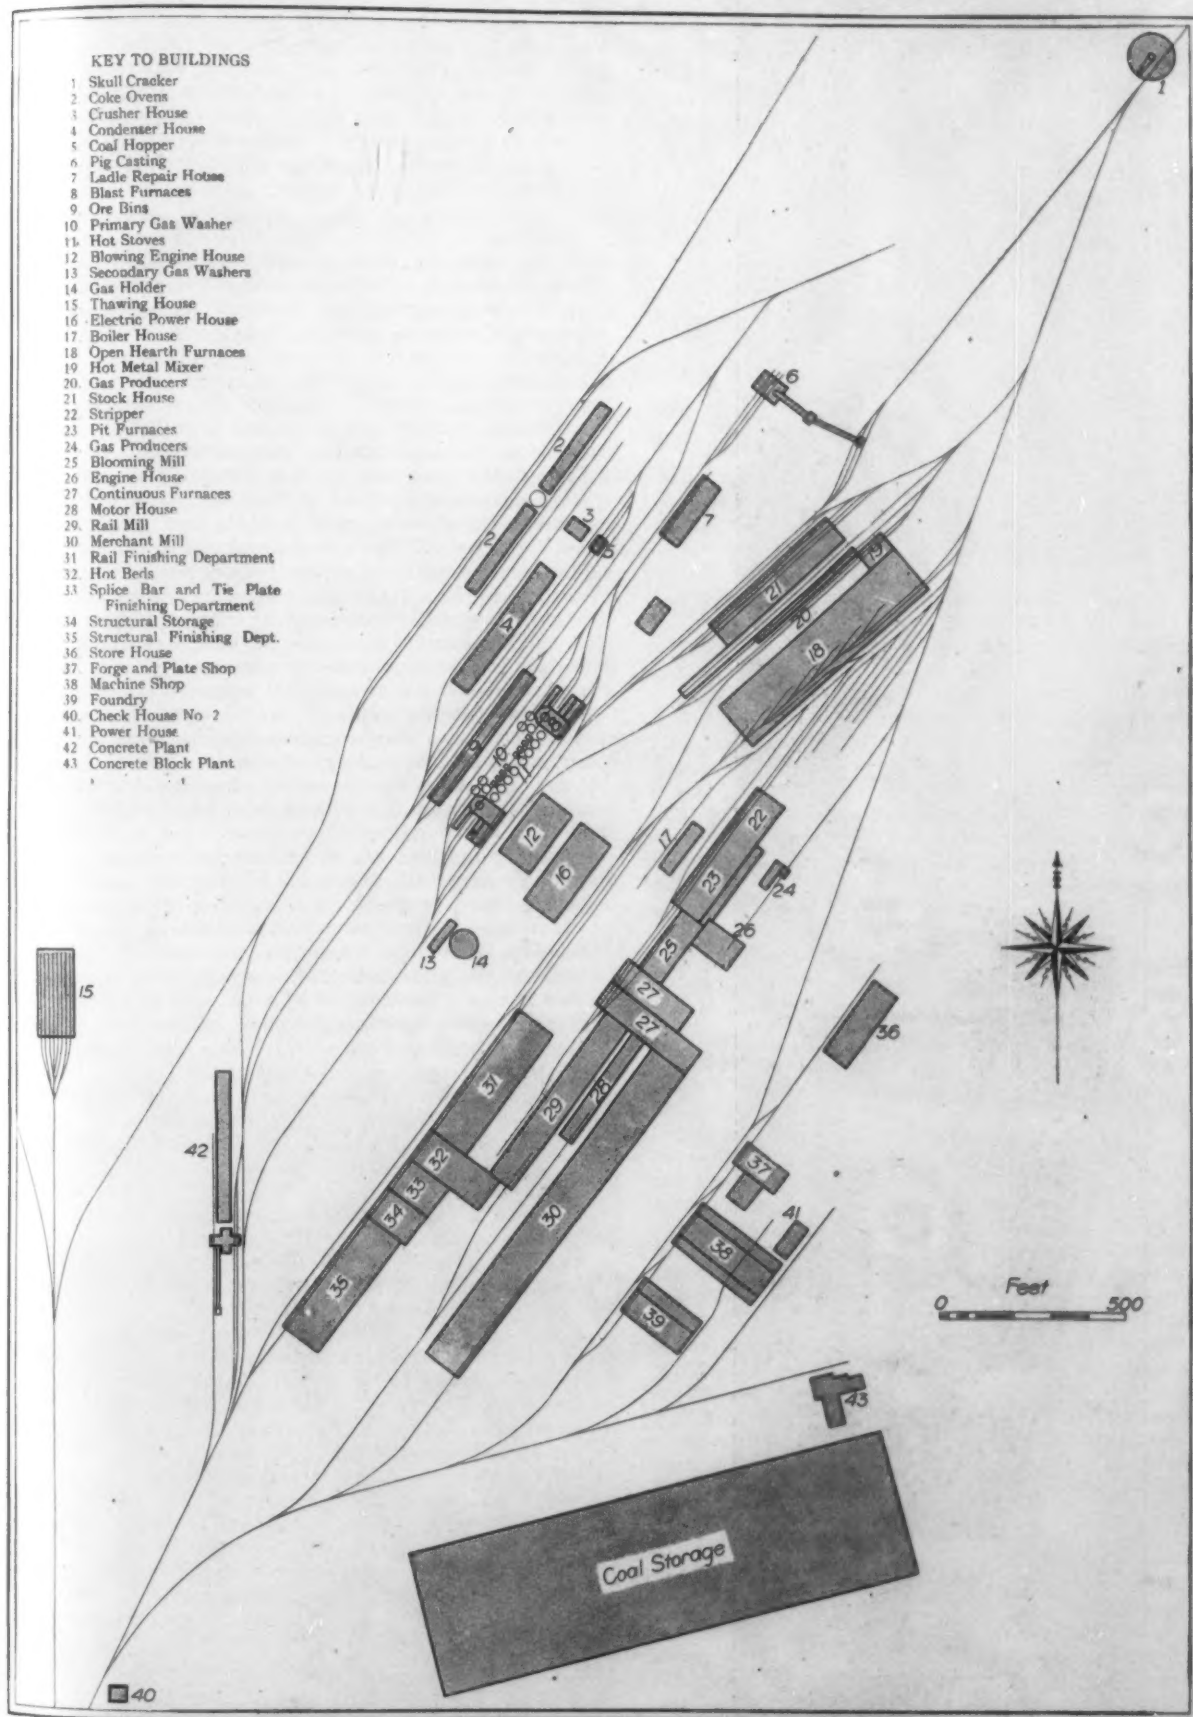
Arrangement of Buildings of the Minnesota Steel Company's Plant.
